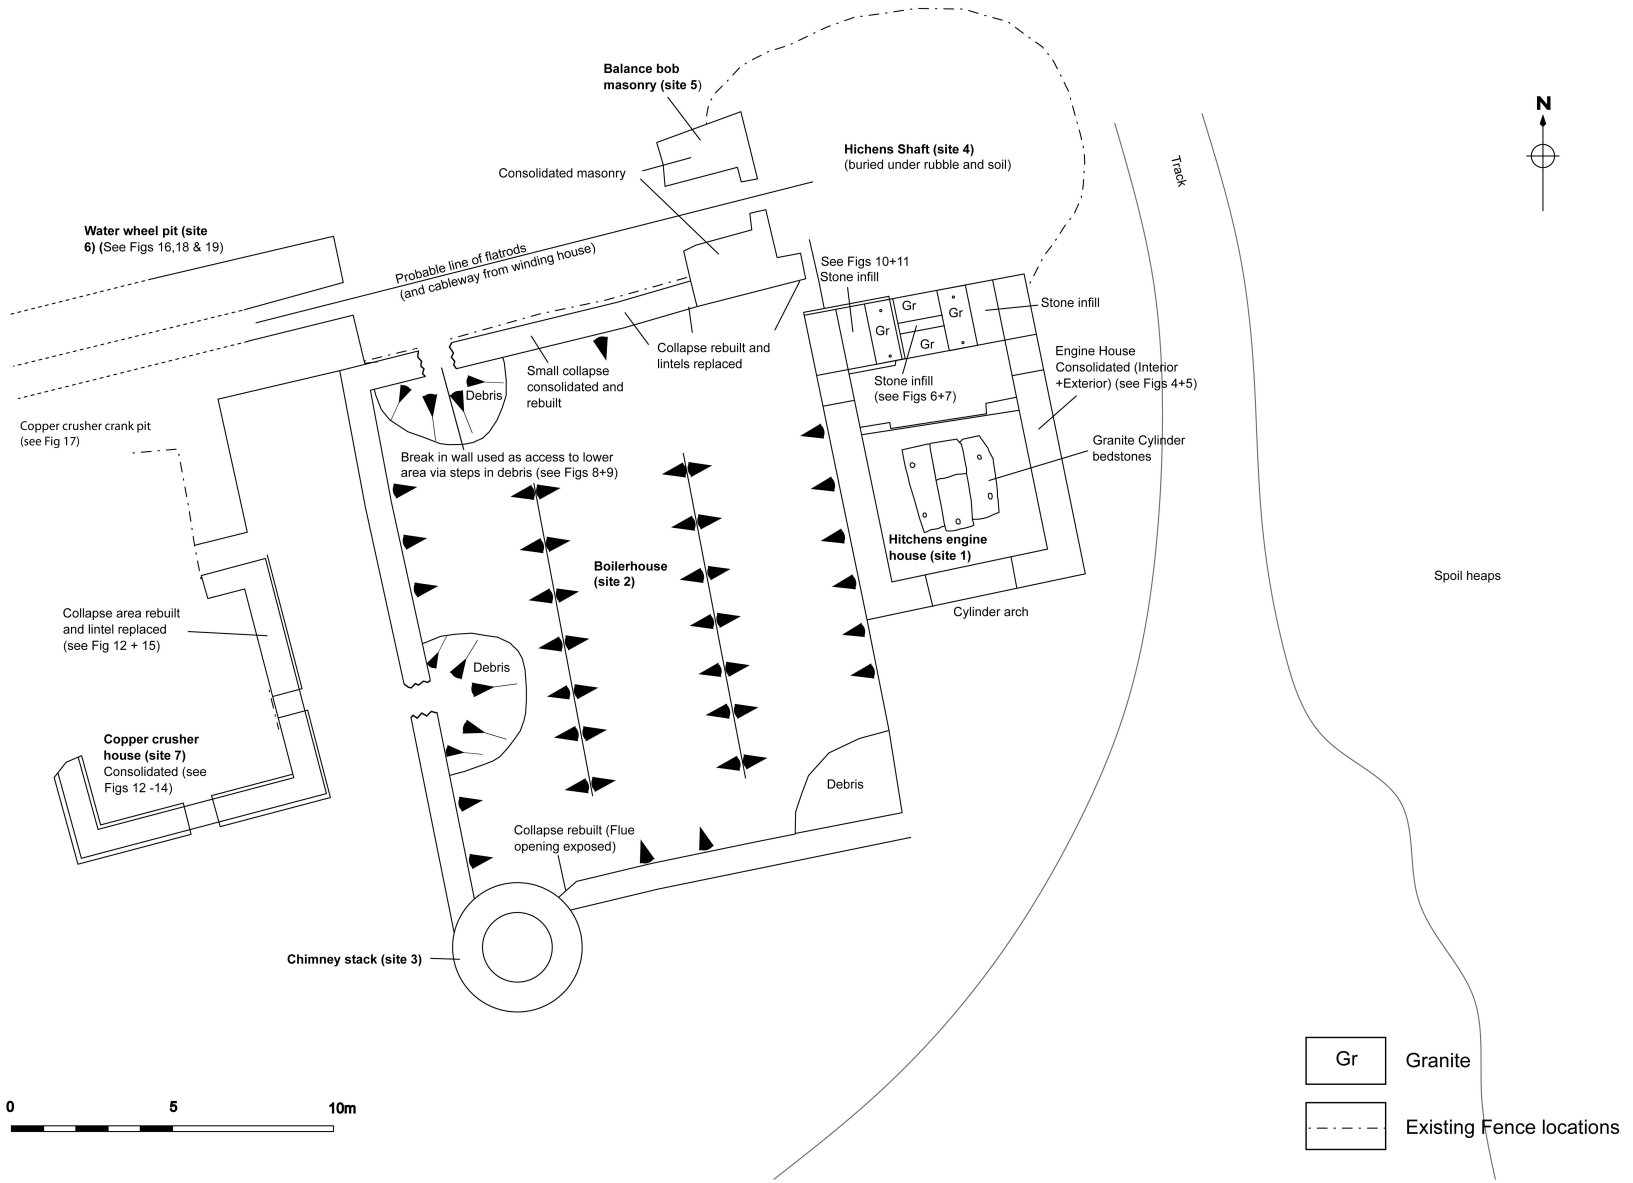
Survey plan of the engine house, boiler house and copper crusher after works
